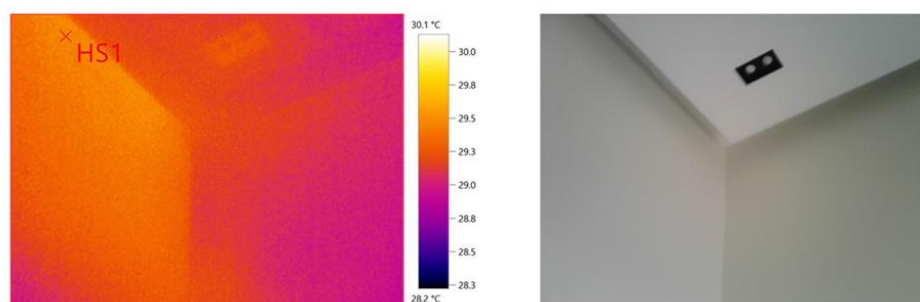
Thermal image of southwest corner of PC02 shows a temperature difference between the wall-to-wall and wall-to-ceiling joints and the rest of the wall. The thermal image was taken on November 17, 2021 at 1:45 pm local time.
